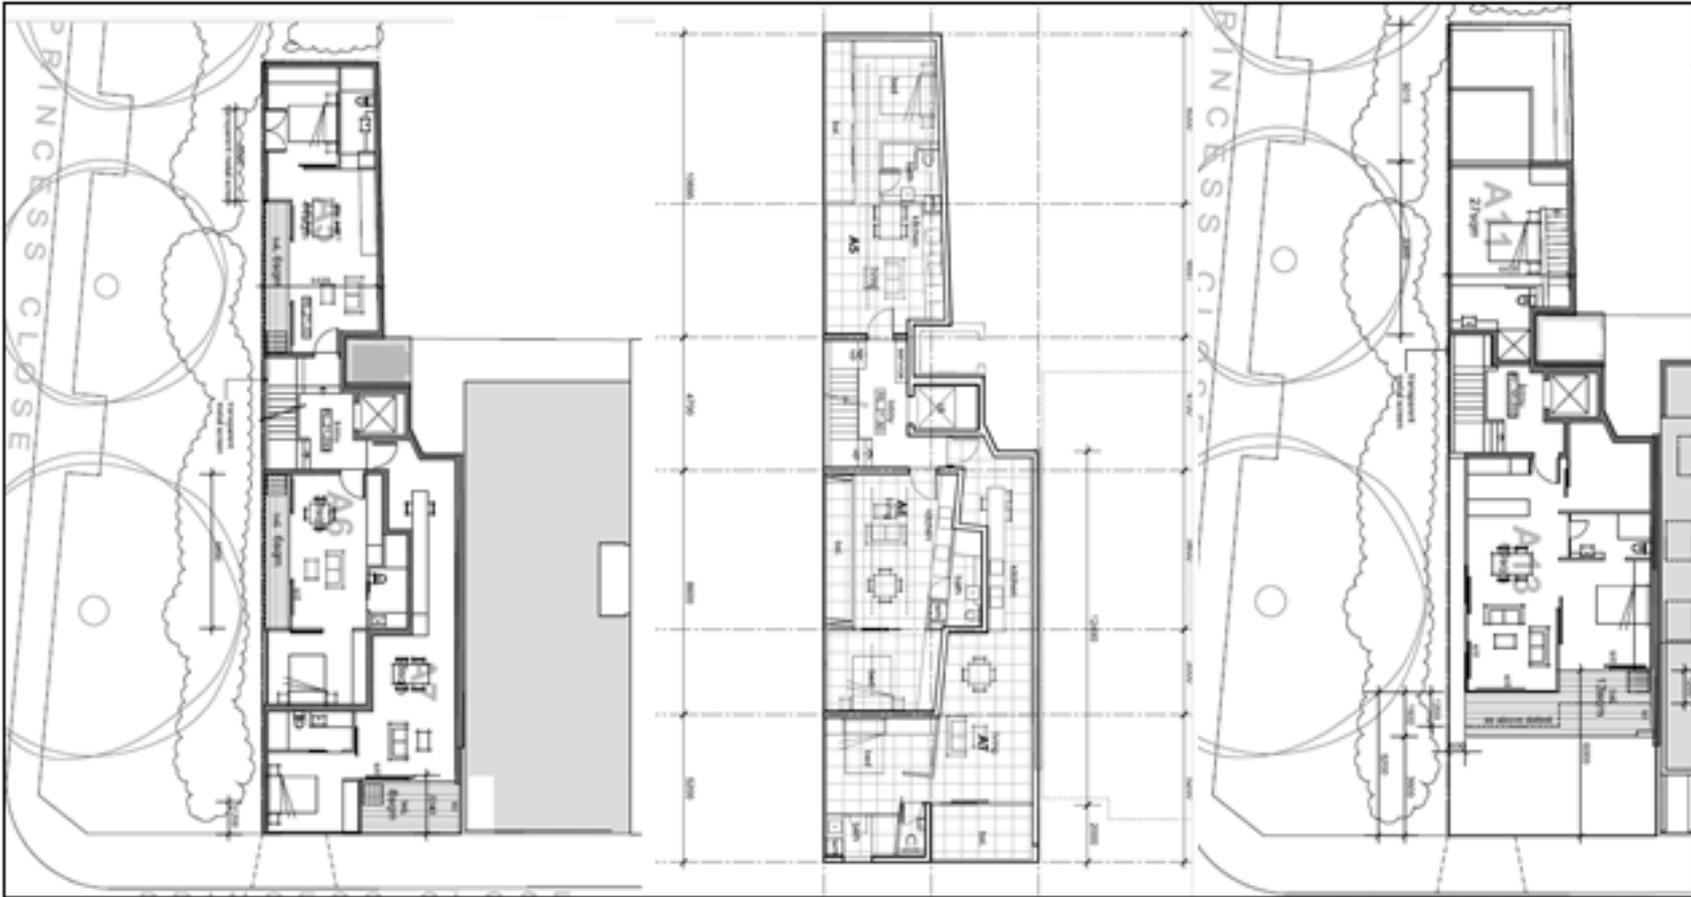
2.3 SHOWING TYPICAL APARTMENT LAYOUTS FOR EXAMPLE 1 ABOVE
